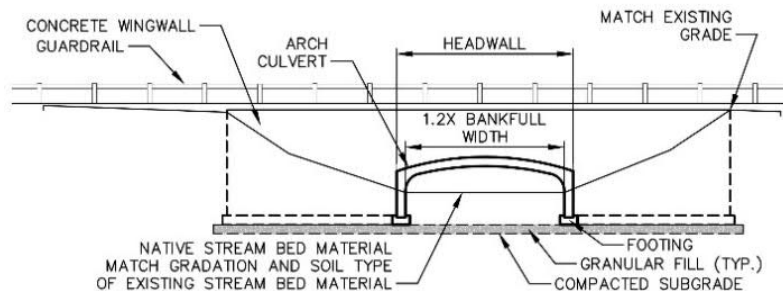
Typical detail of an open arch culvert designed to meet MA Stream Crossing Standards
